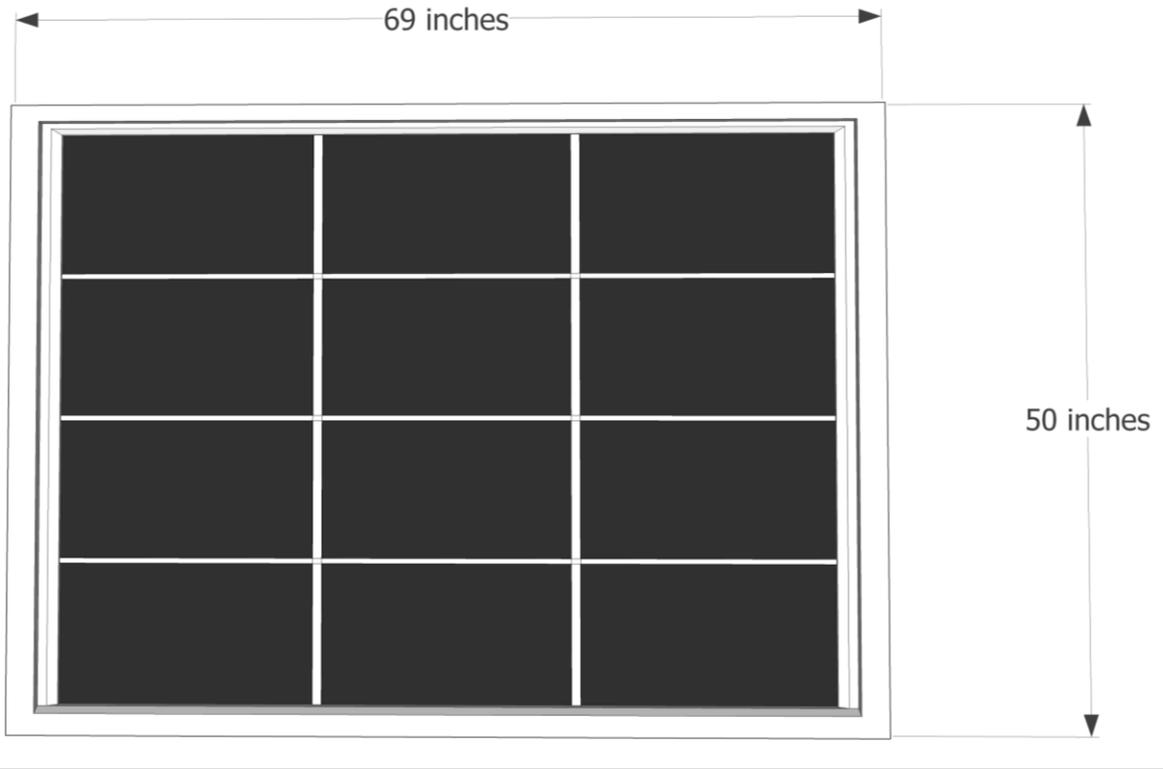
EXHIBIT D: Window Sample of Proposal Option 2 and 3 – Staff Provided
